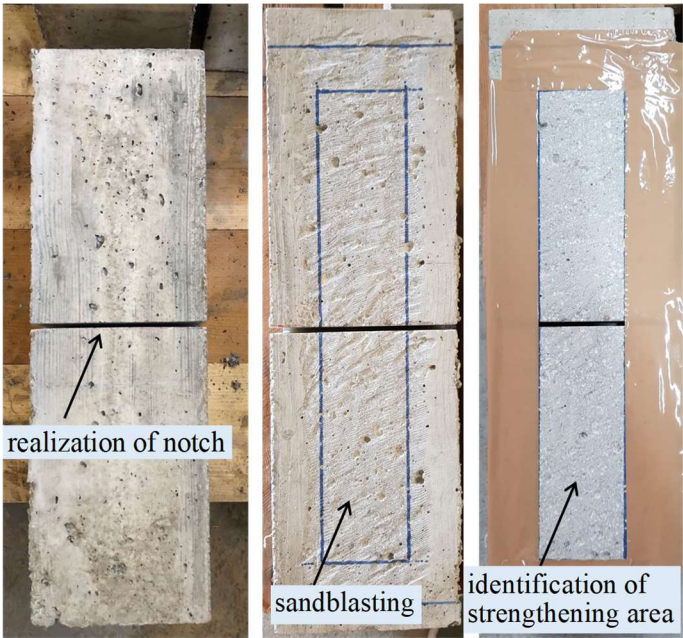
Preparation of concrete beams before application of the strengthening system
